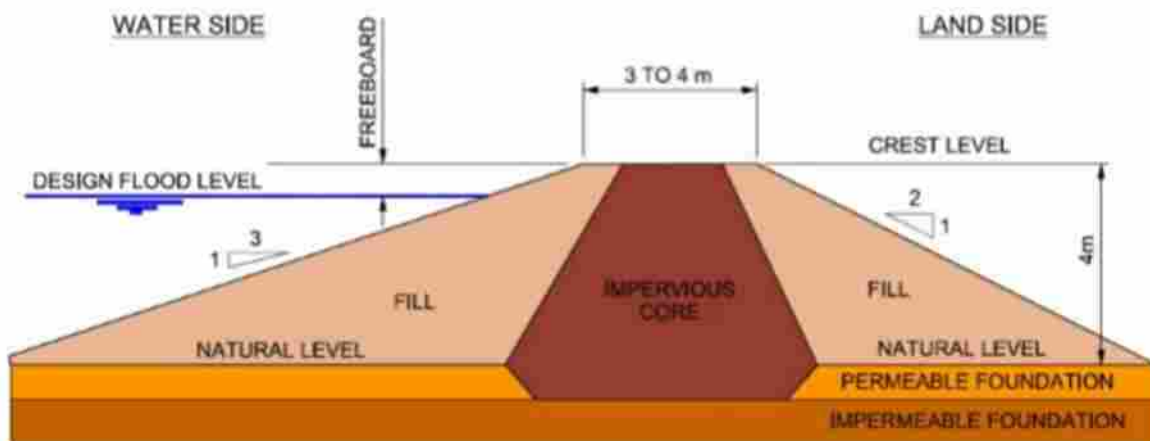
Typical NSW earth embankment levee cross section (from the Levee Owners Guideline)
